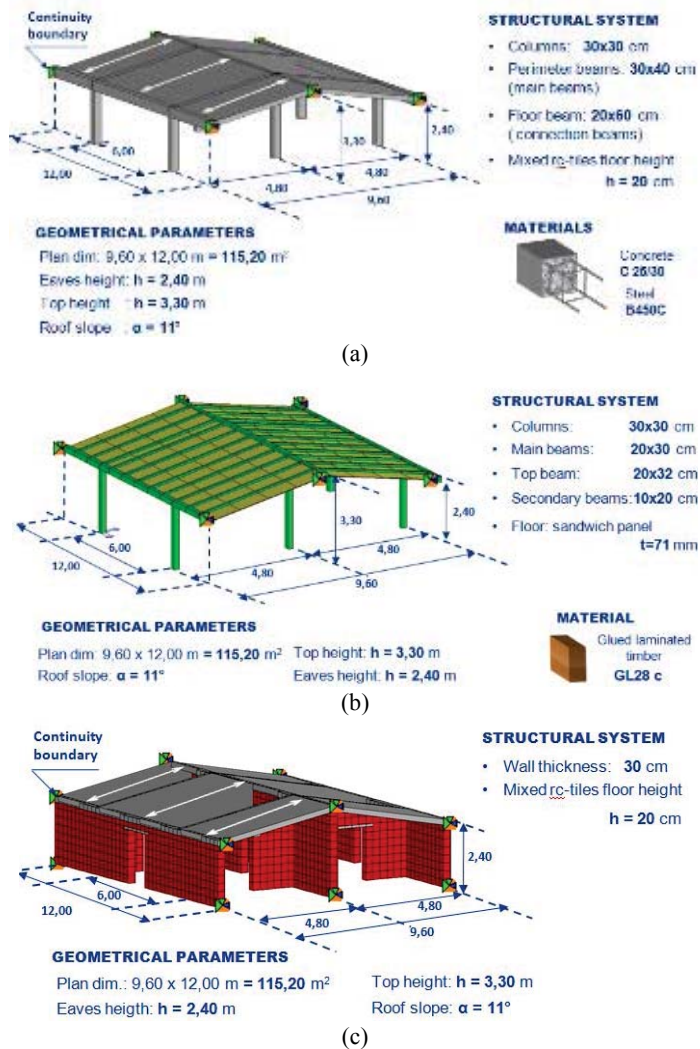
The case study of a masonry building subjected to a vertical addition intervention.
